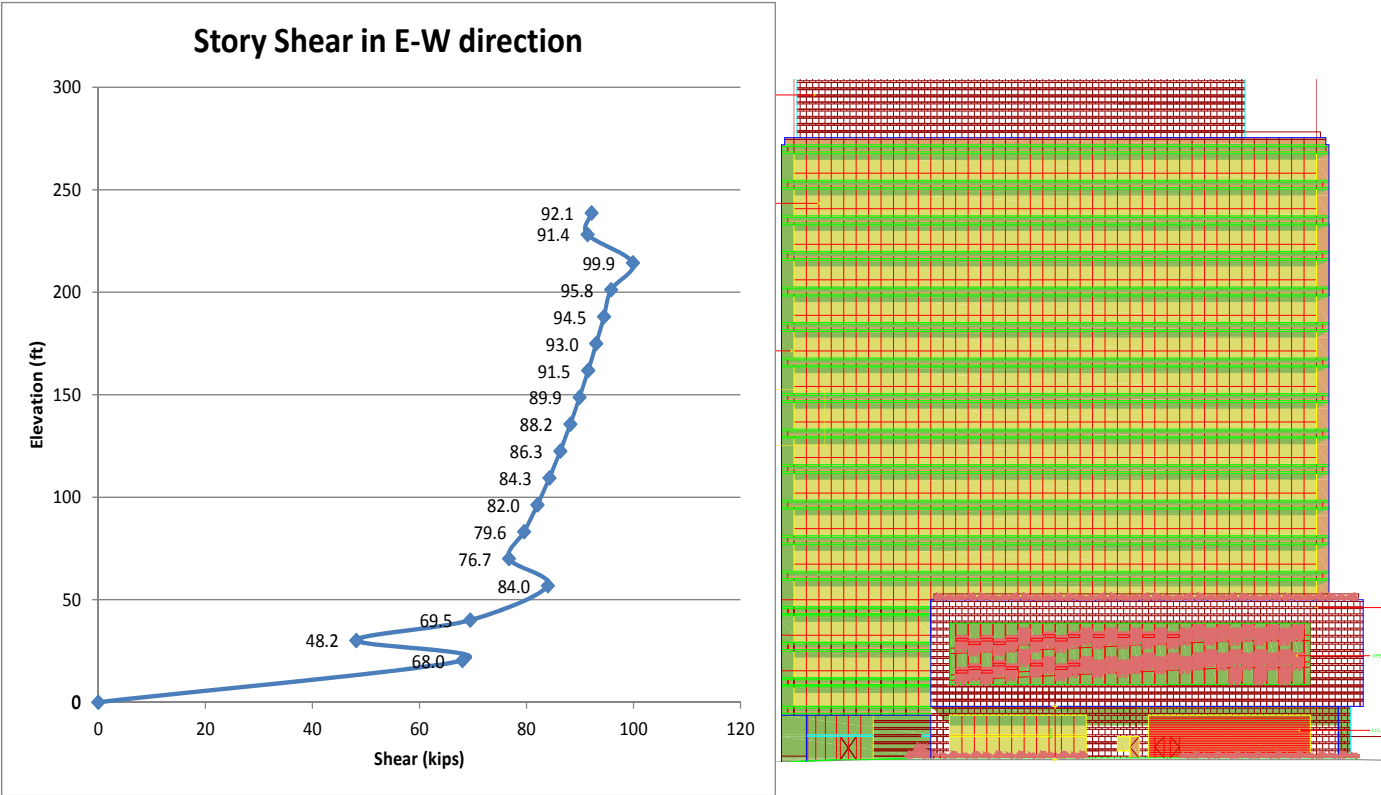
Story shear forces in E-W direction. The elevation shows south facade.
